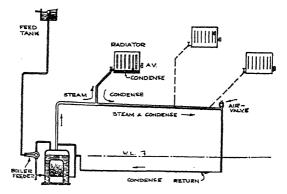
Low-Pressure Steam Heating, Single Pipe System.
